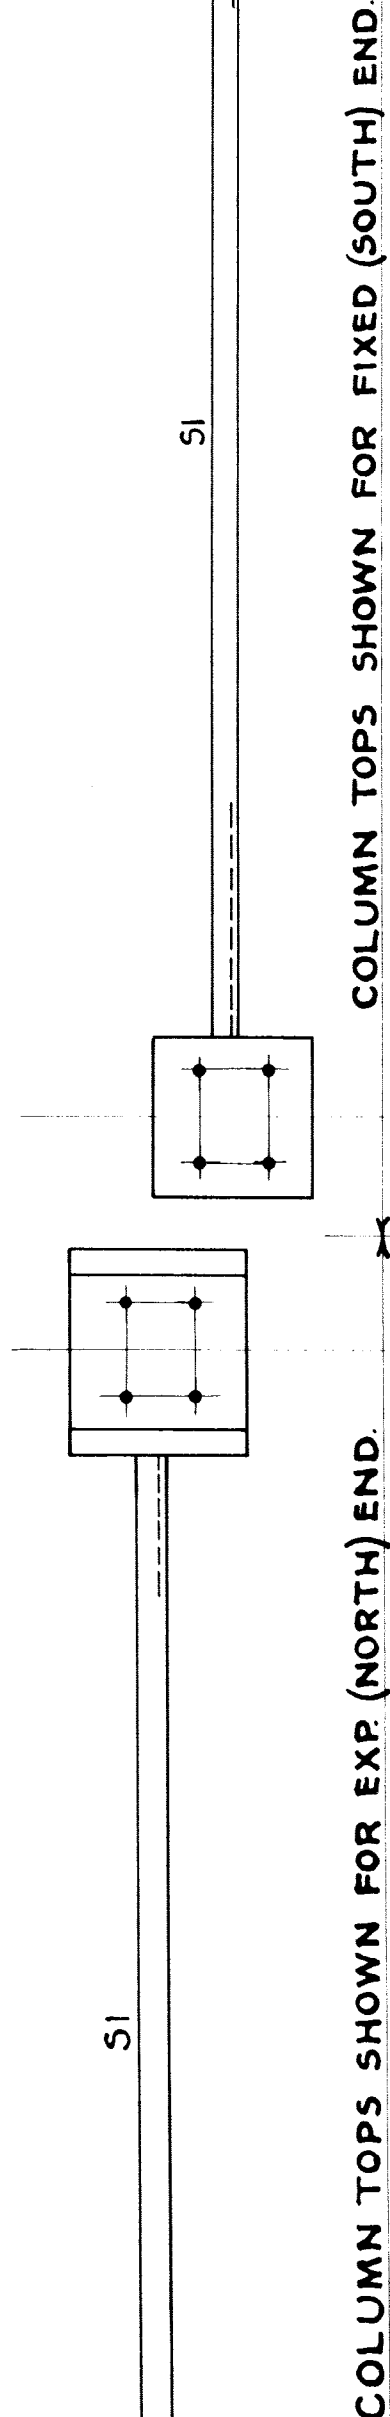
DETAIL OF COLUMN TOP EXP. END. COLUMNS - C1.
